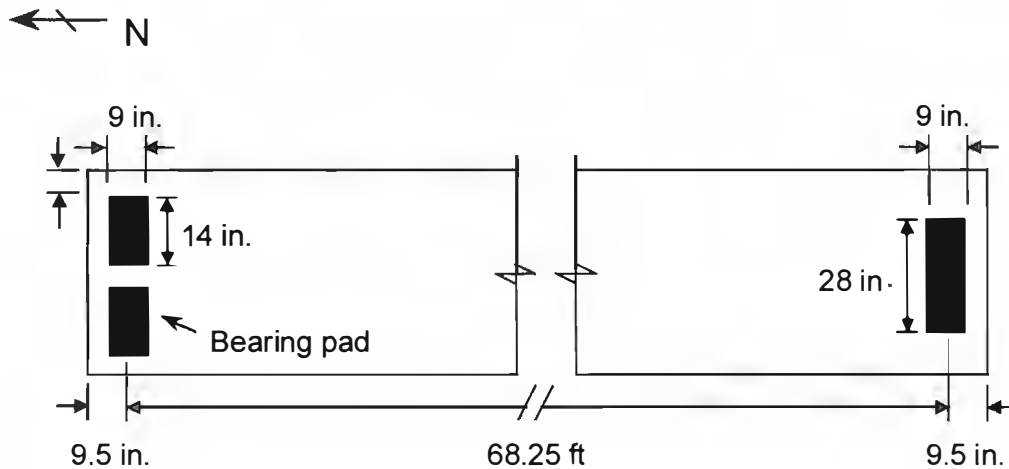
Plan of bearing pad placement for flexure-dominated specimens
